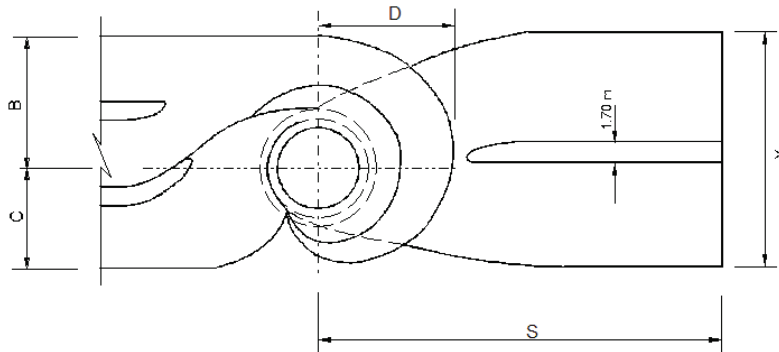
Plan of semi-spiral casing and draft tube – Kaplan turbine with semi-spiral casing made of concrete.
